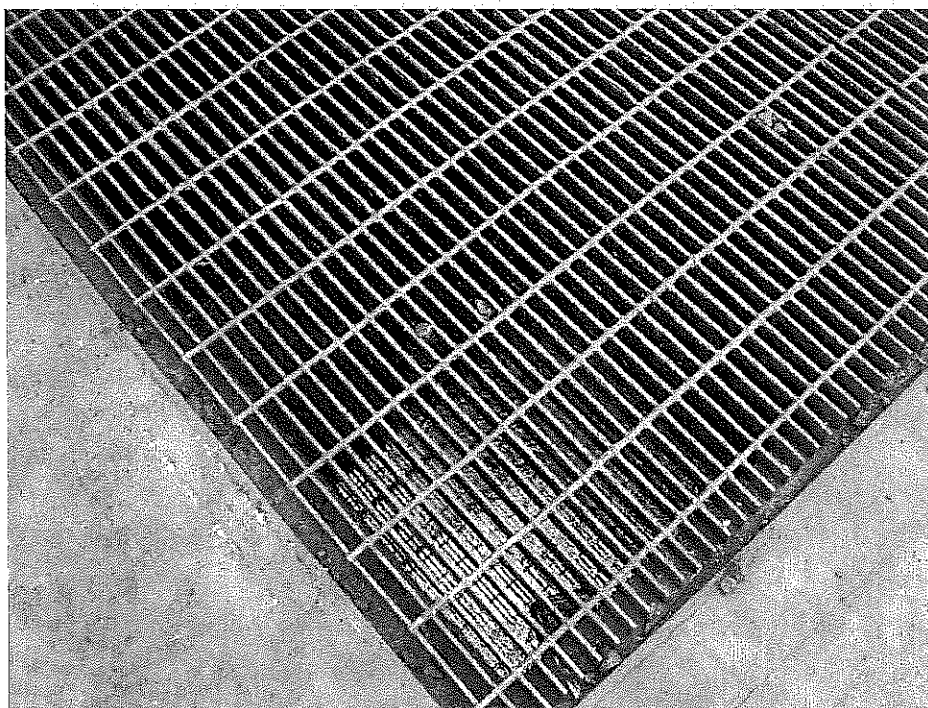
June 16, 2011, 9:30 a.m. Fenced storage pad sump, at Sinter Plant.
